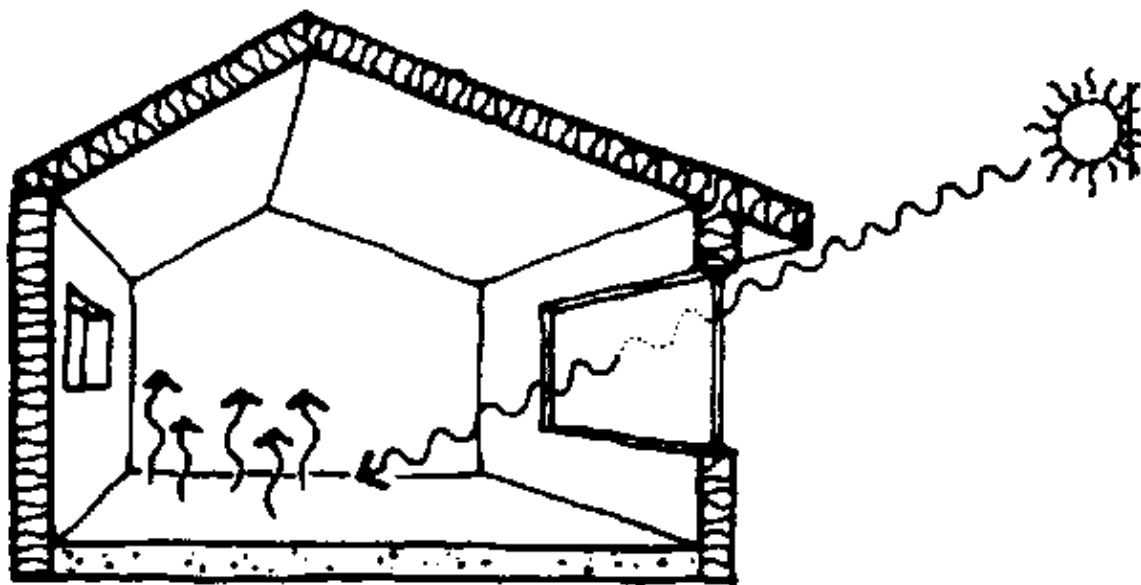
A concrete floor slab used in winter to store the sun's incoming energy be used instead.
